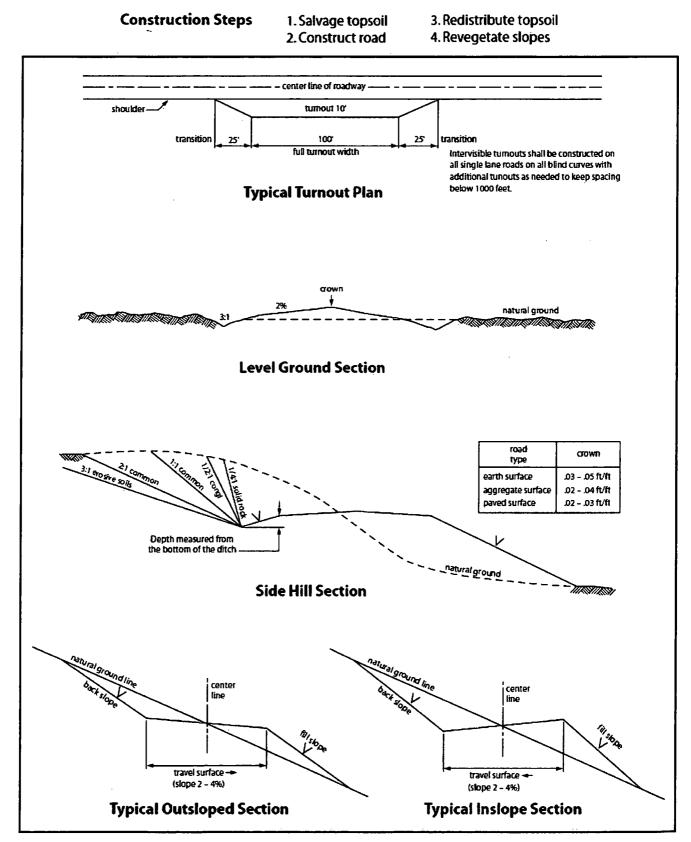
Cross-sections and plans for typical road sections representative of BLM resource or FS local and higher-class roads.
